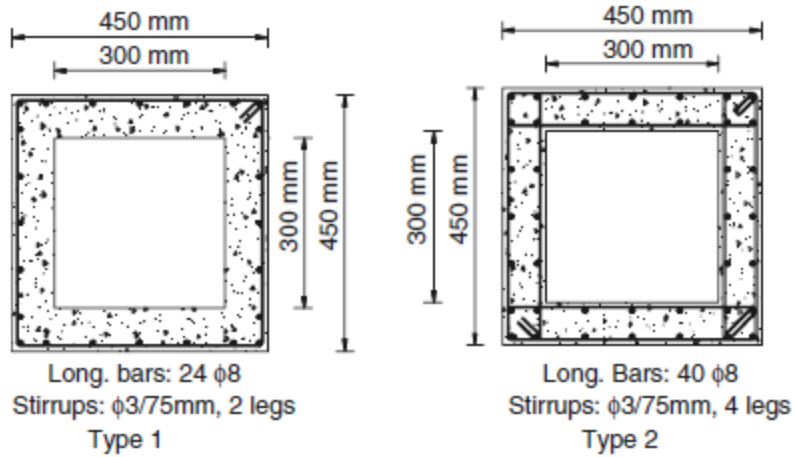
Calvi et al. (2005) Test Specimen Reinforcement Layouts (1 mm = 0.0394 inch)
